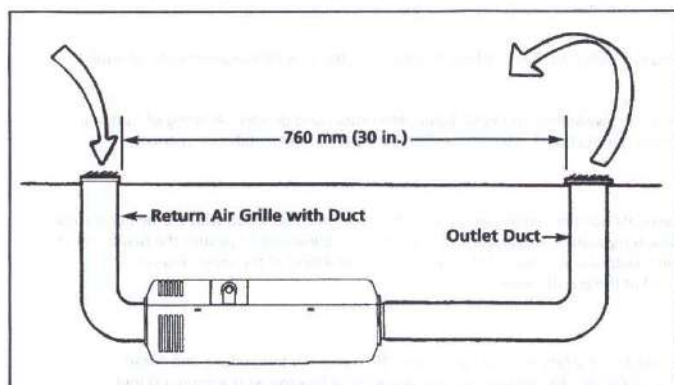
Heater Ducting Method B - Return Air Grille with Duct
